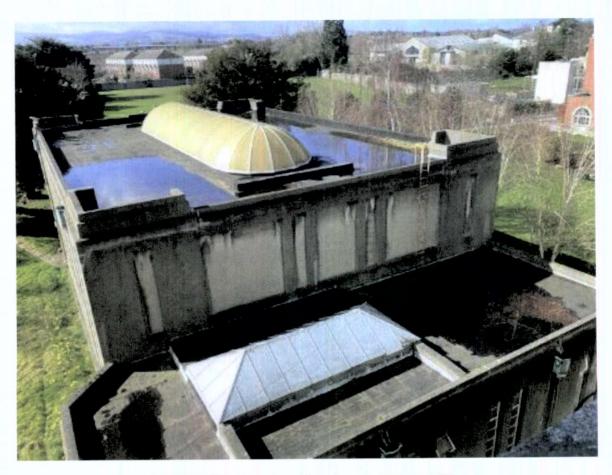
Roof of archive with domed roof lantern, as viewed from the rear extension to MPH
